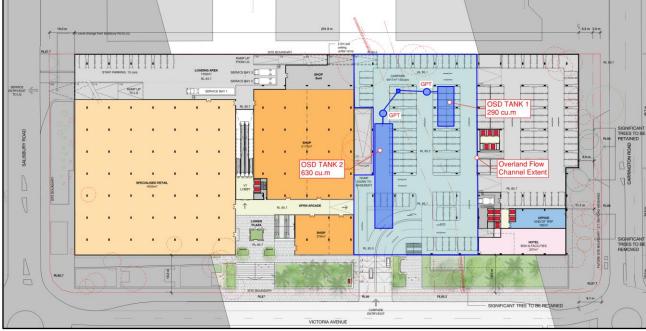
Proposed on-site detention tank locations at lower ground floor level.
